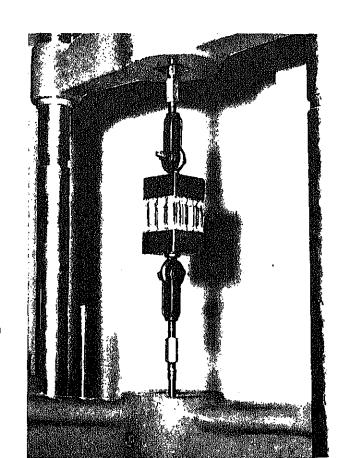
COMPOSITE FLOOR SLAB WITH WIRE "TRUSS" TIES
